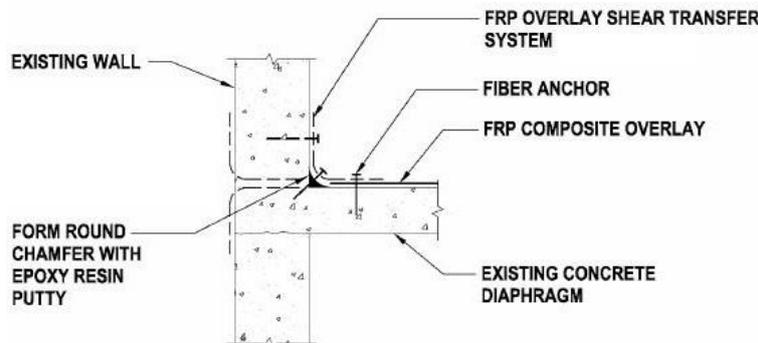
Shear strengthening of concrete diaphragm using FRP composite [1].
